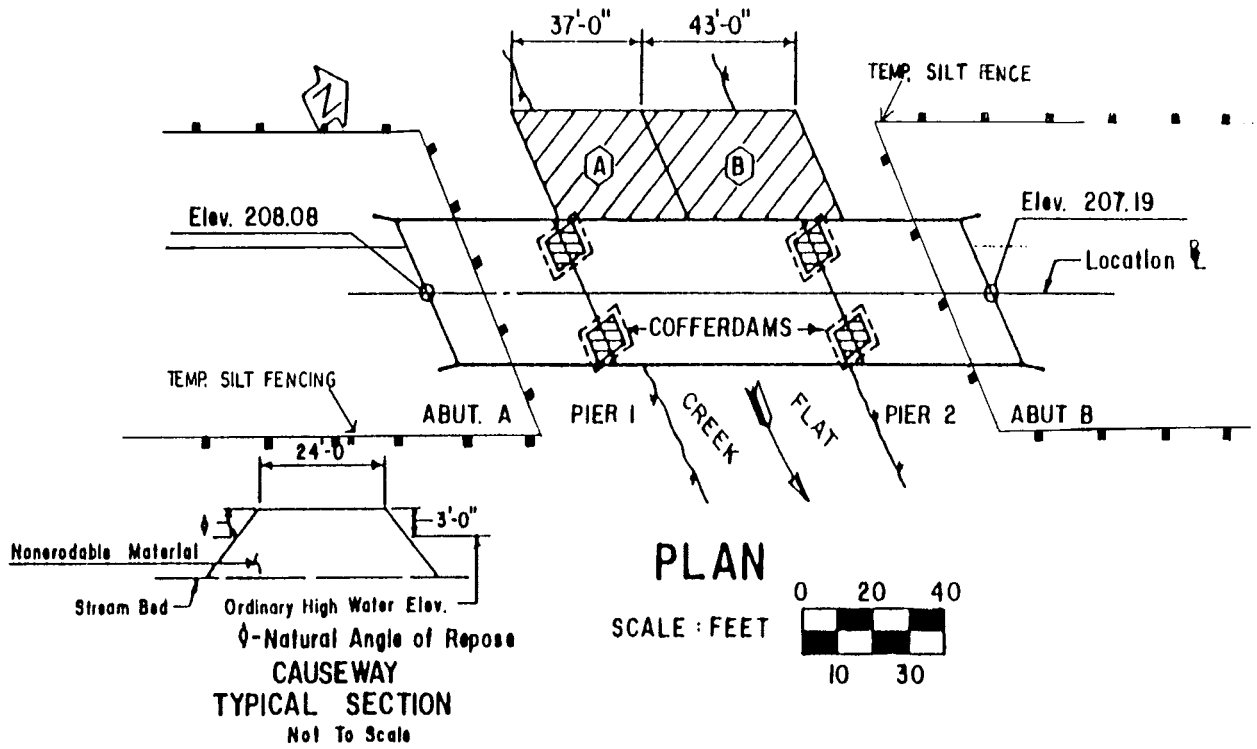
PROPOSED BRIDGE PLAN-PROFILE SKETCH
